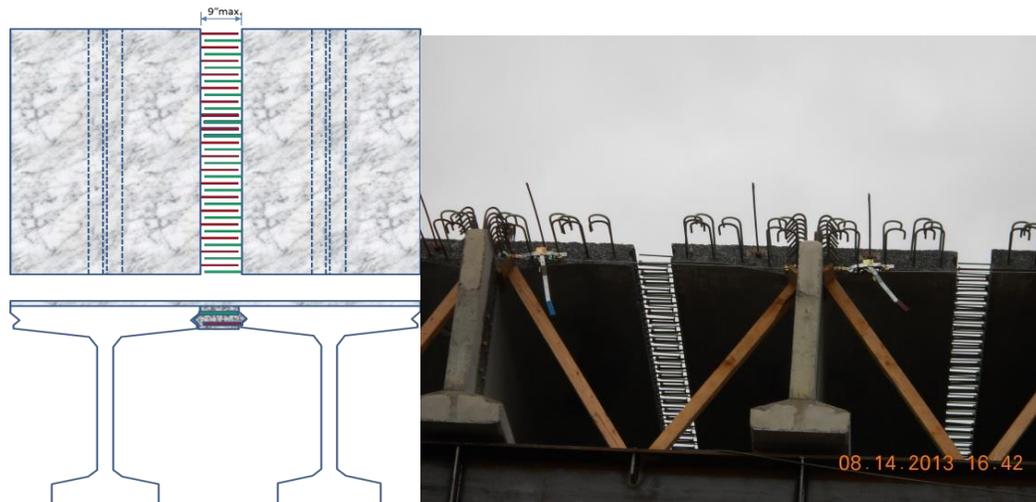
Deck Girder Joint with UHPC closure and non-contact splice
